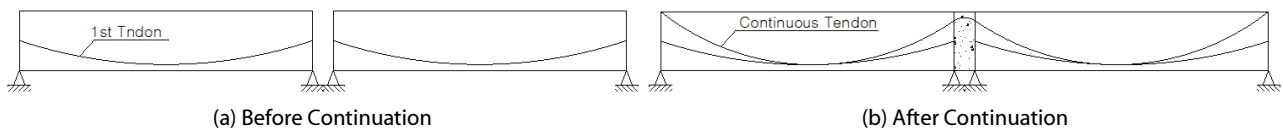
Conventional Concept of Continuous Tendon Placement in Precast Prestressed Concrete Girder Continuous Beams
